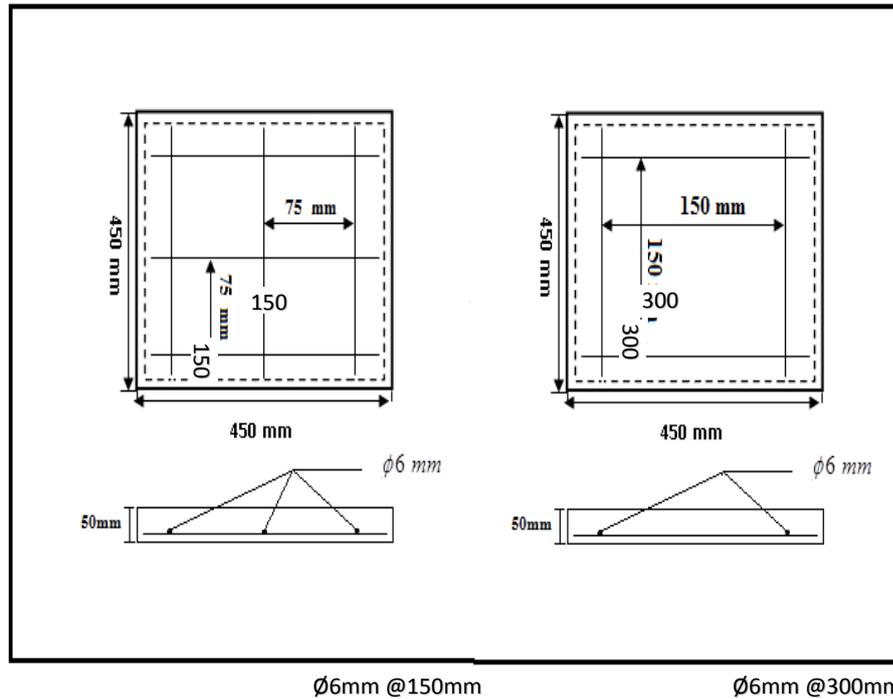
Dimensions and Reinforcement Details of Slabs [3]
